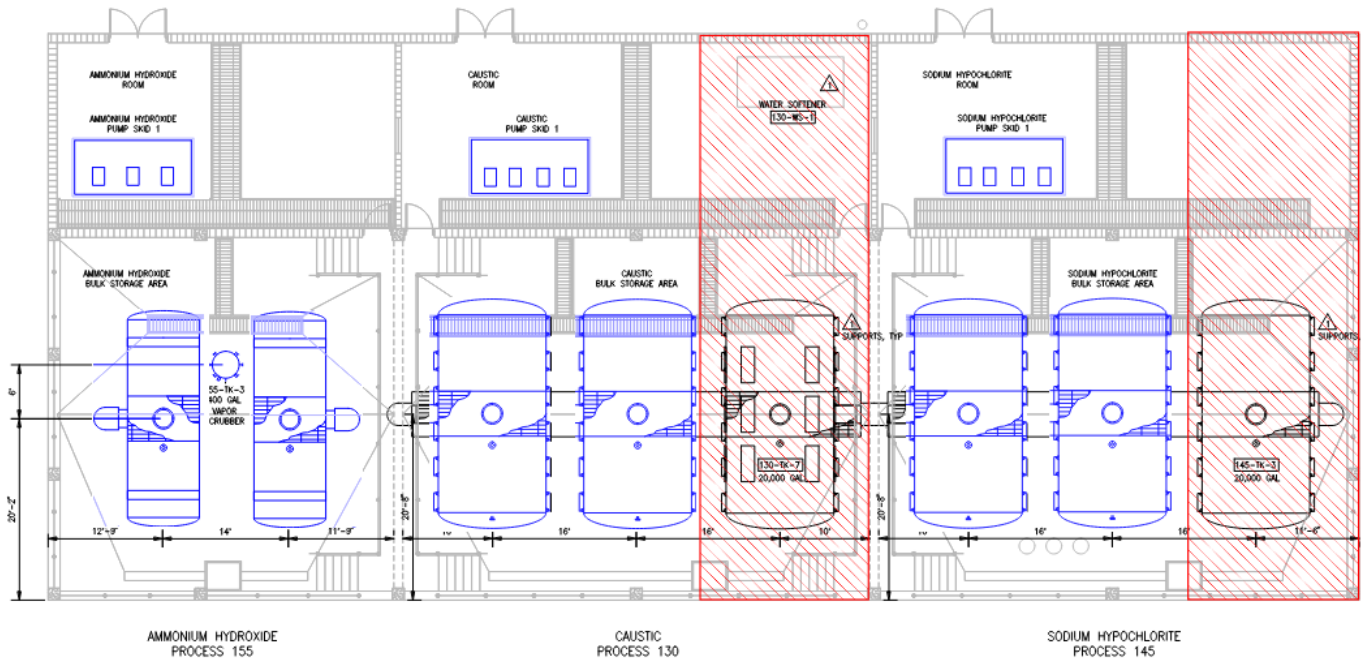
Concept Layout of Proposed Hypochlorite Storage and Feed Building
